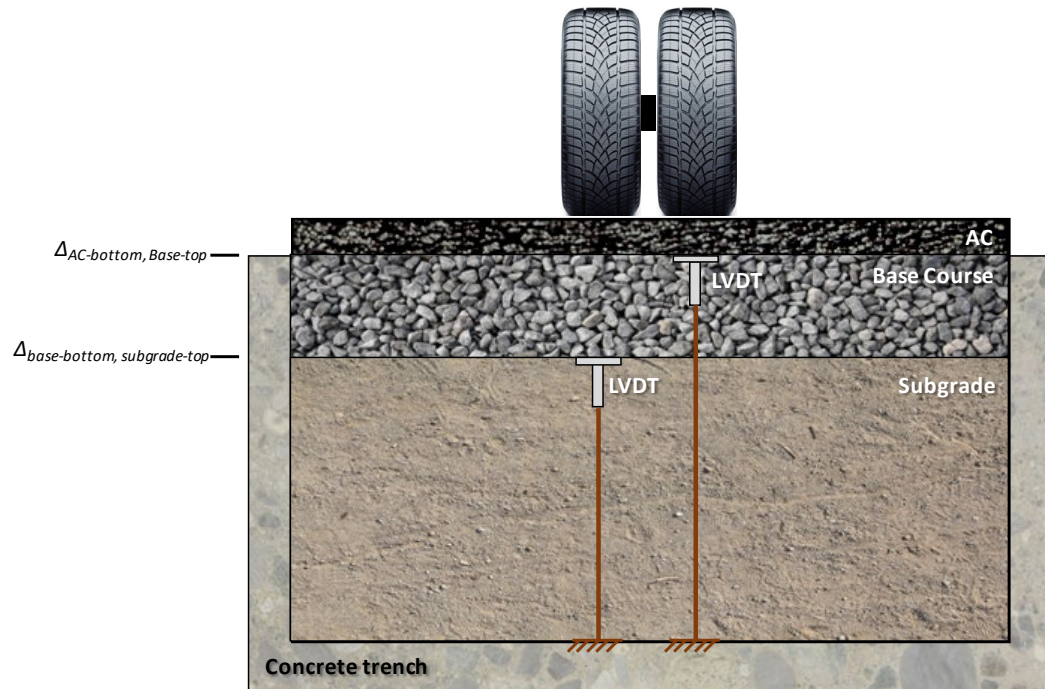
Cross-section of LVDT installation in the subgrade and base course.
